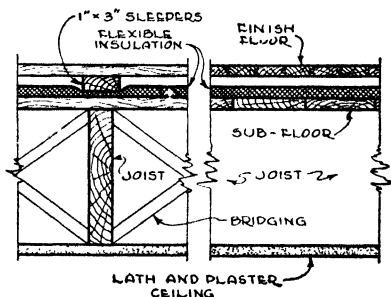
A. Same as Fig. 10, but with Flexible Insulation Instead of Structural Insulating Board
